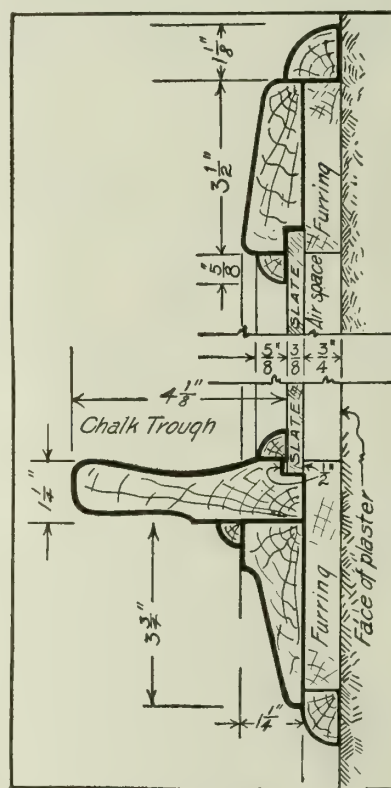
SECTIONAL DETAIL SHOWING CONSTRUCTION OF SLATE BLACKBOARD
